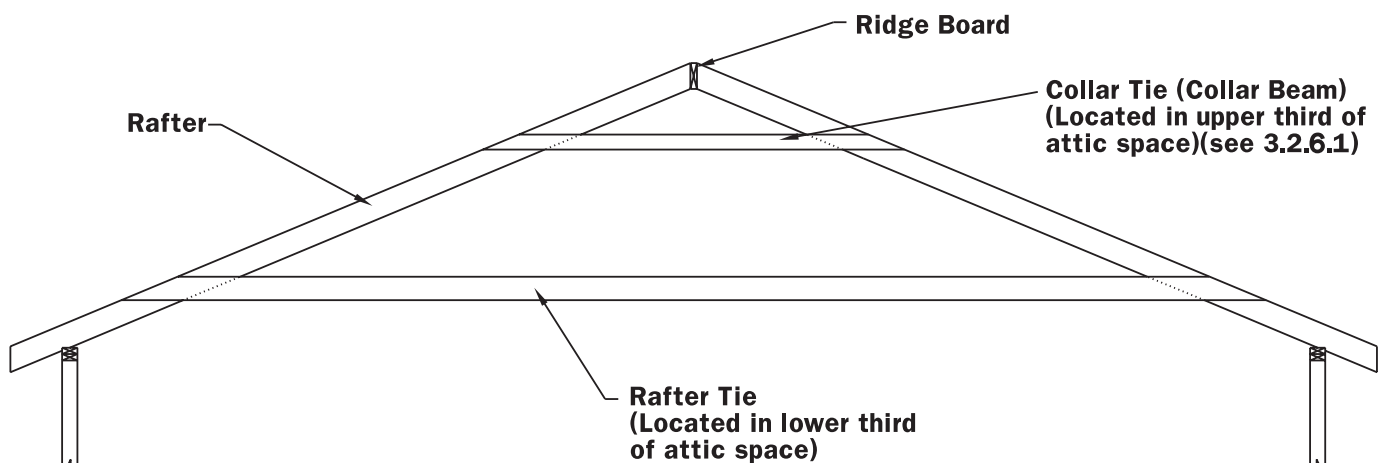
Ridge Beam DetailsFigure 3.10b Ridge Board and Ceiling Joist DetailFigure 3.10c Ridge Board and Rafter Tie Detail
